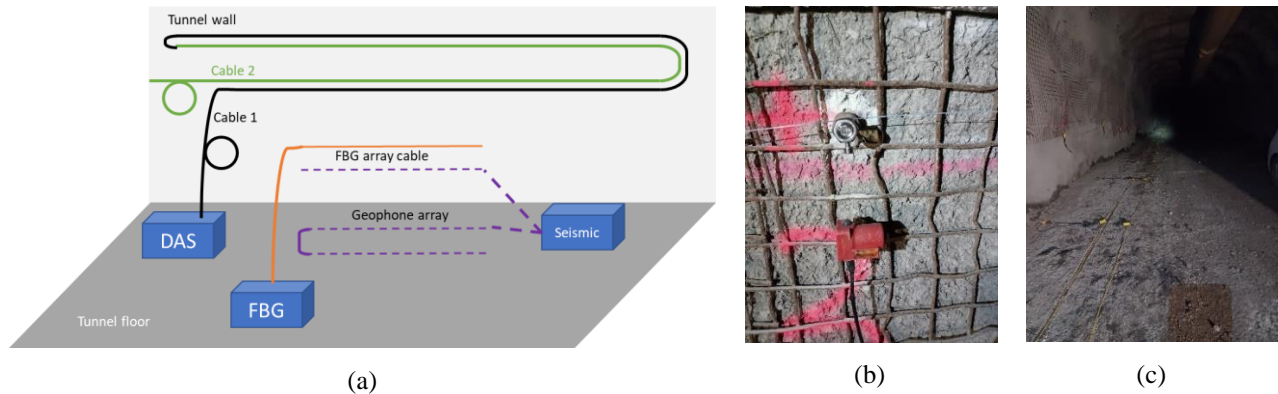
(a) Sketch of the sensor layout in the underground tunnel wall and floor. (b) Example of a collocated FBG spike and horizontal in-line geophone installed in the tunnel wall at a specific location. (c) Deployment of the geophones on the tunnel floor for further monitoring.
